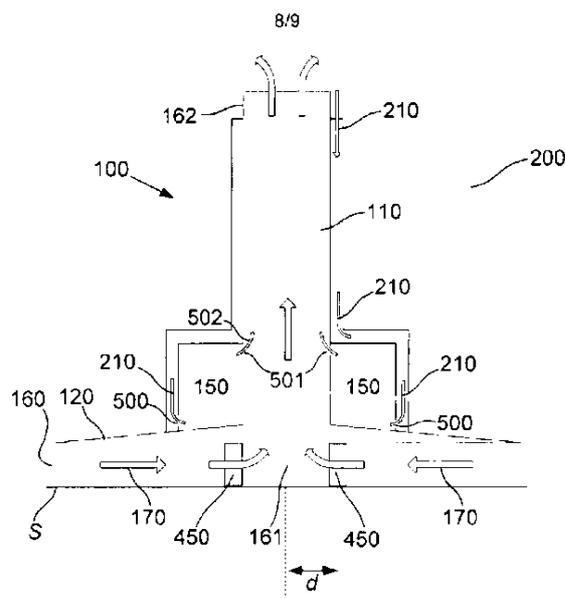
Schematic side view of a solar tower for providing cooling, according to an embodiment of the invention
